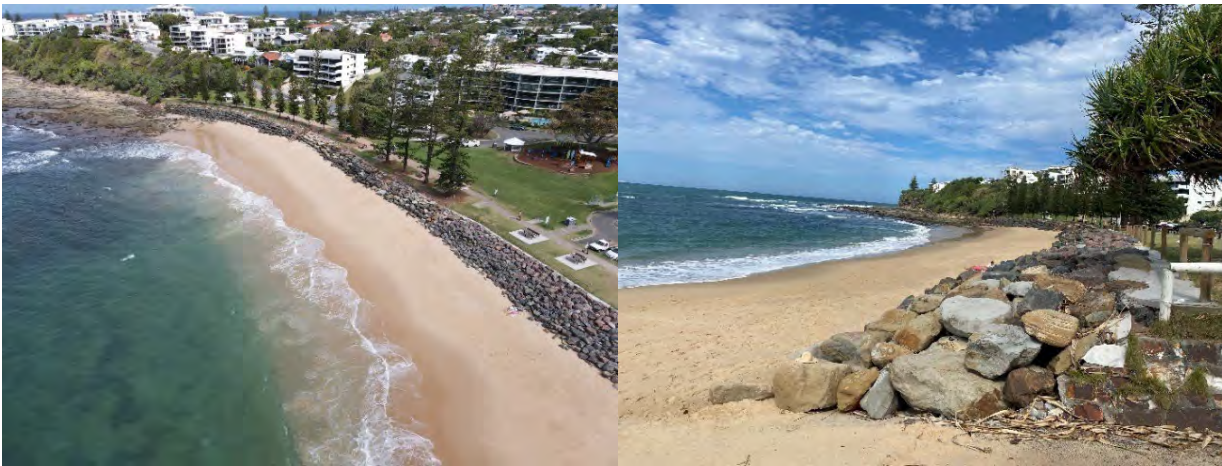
Existing defence at Moffat Beach. Left: Aerial view. Right: The new structure near the boat ramp (JBP 2023)
